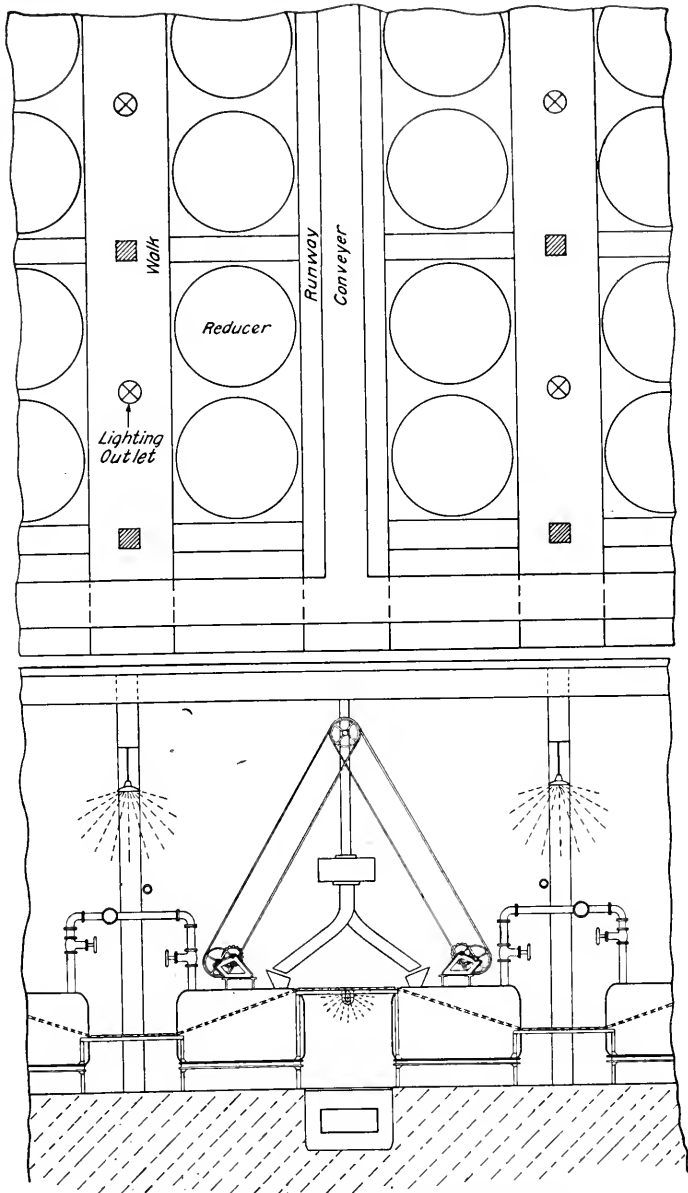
Plan and Elevation of Portion of Reducer Plant Showing Arrangement of Reducers and Lighting Units
